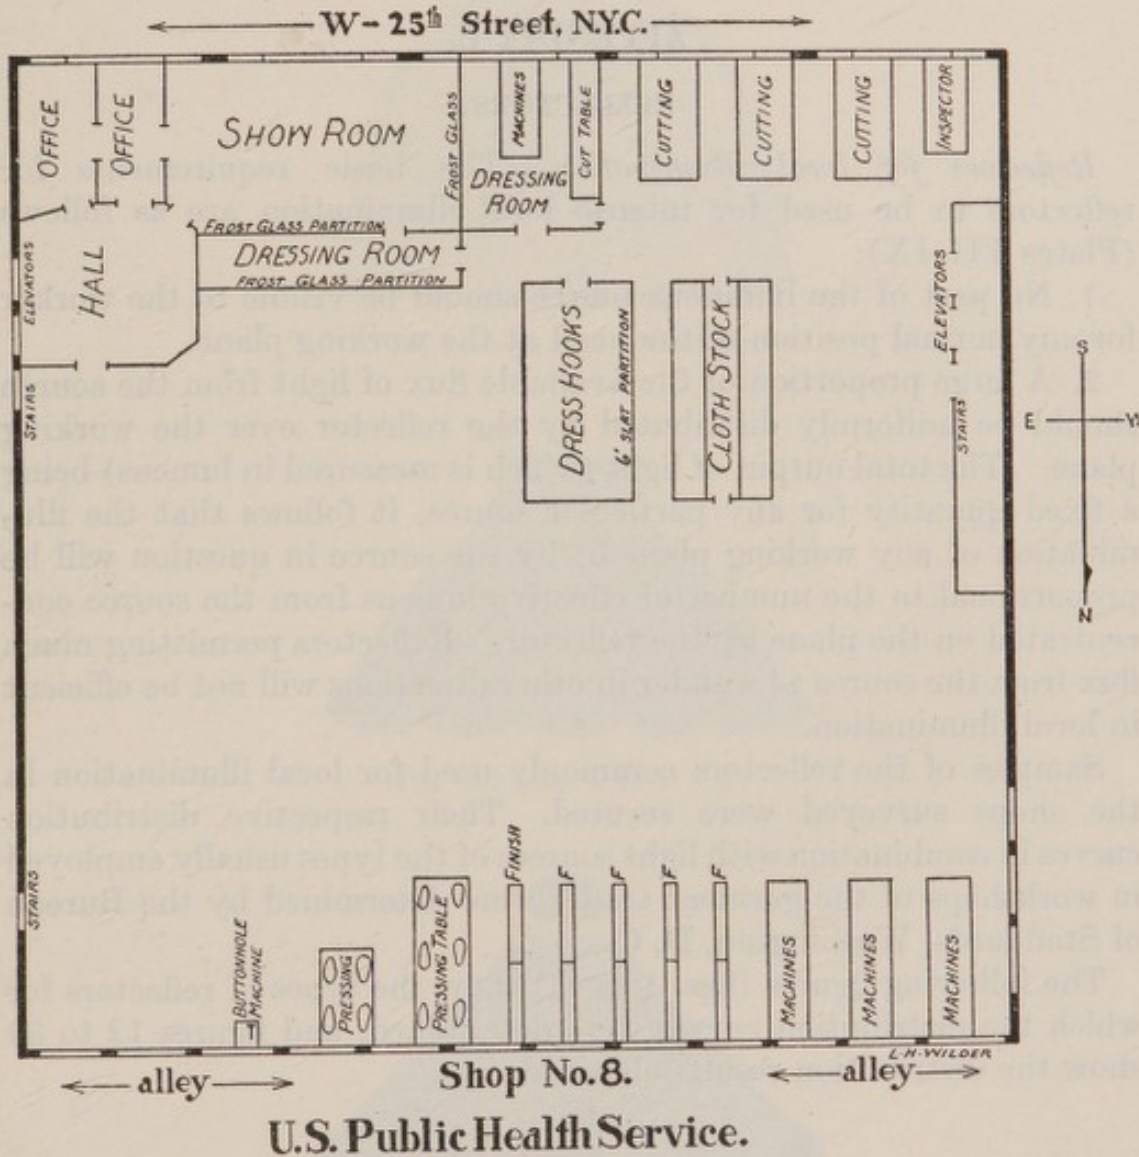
Rearrangement of working planes shown in Fig. 1 to secure better illumination.
